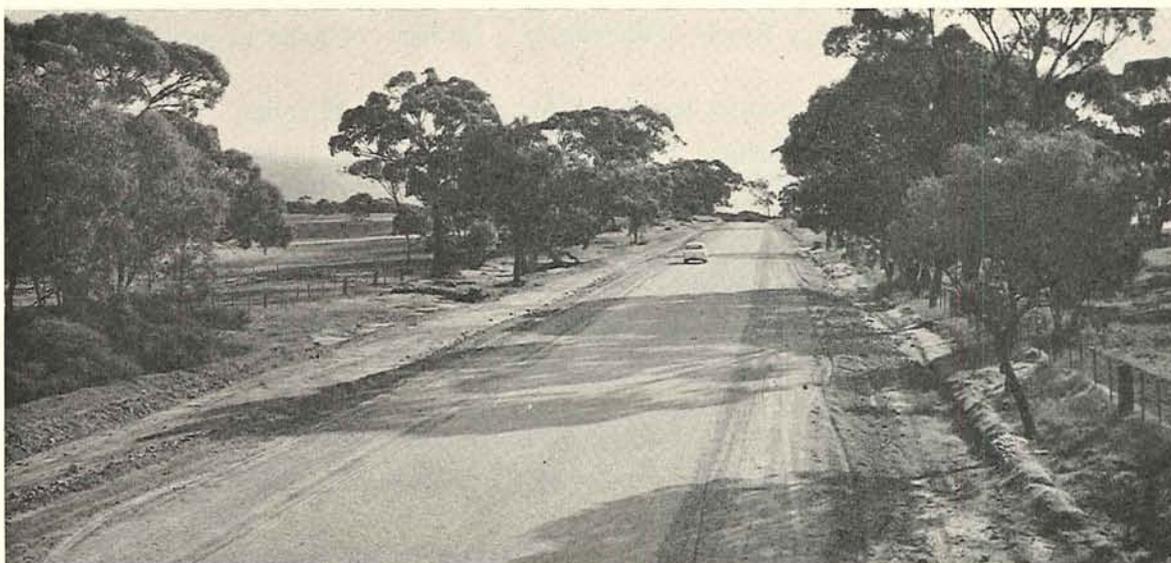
Dimboola Shire—Reconstructed section of Rainbow Road.
